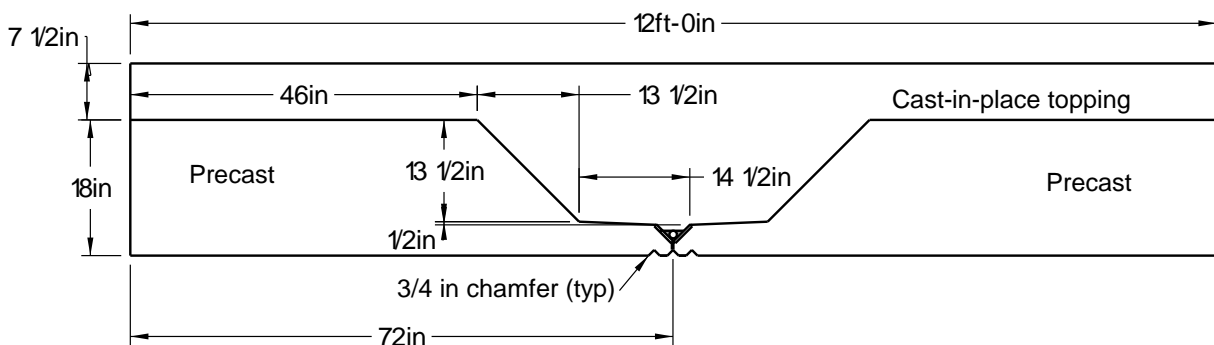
Cross-sectional Geometry of Welded Connection Test Specimen
